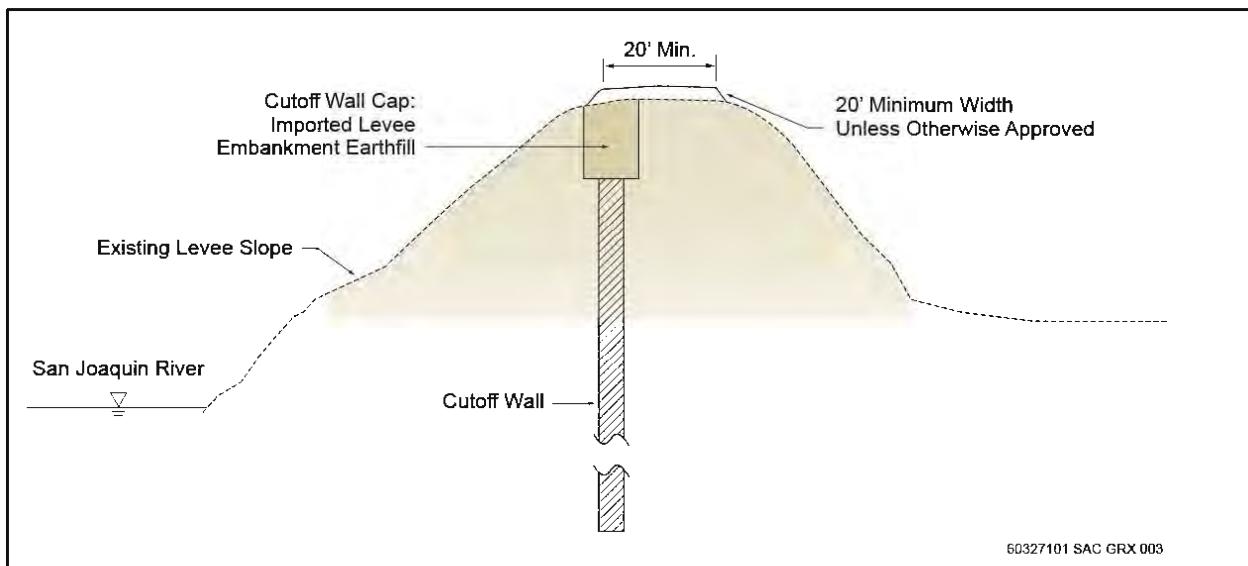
Typical Deep Slurry Mix Method of Cutoff Wall Construction
